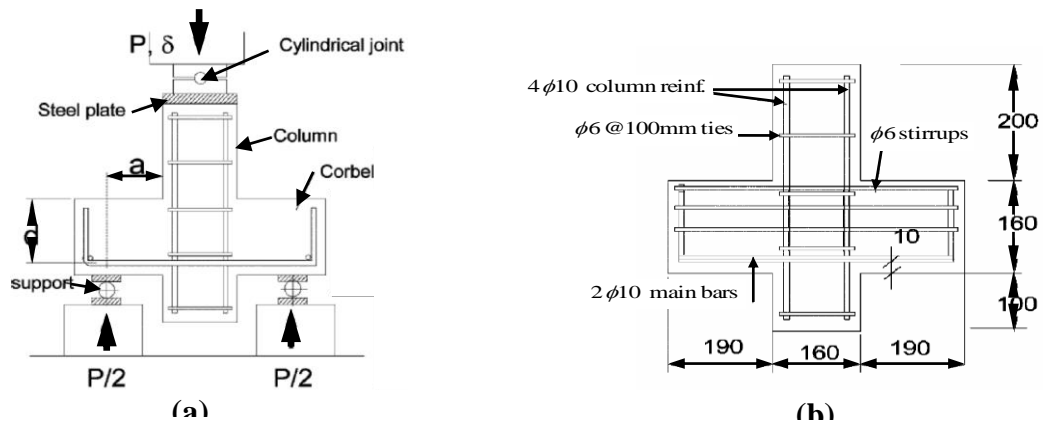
Test specimen [7]: (a) Loading arrangement; and (b) Dimensions and reinforcement details.
